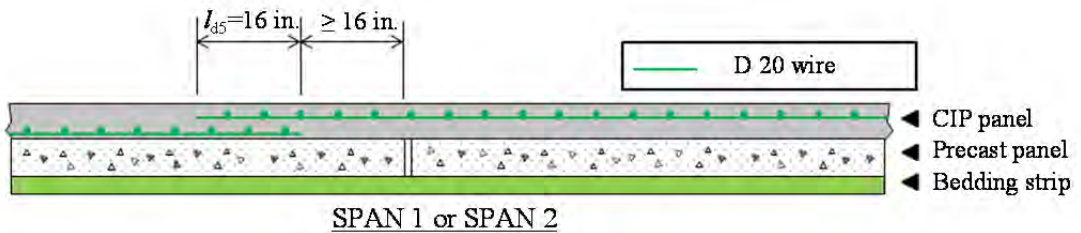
Details of longitudinal splices, Lampasas River Bridge (Section E-E)
